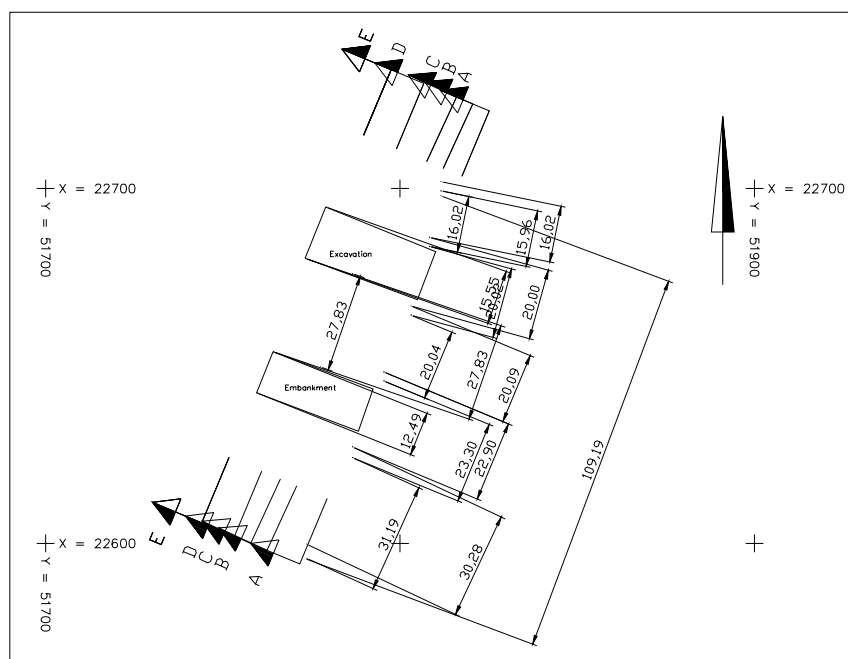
Plan view of the test embankment and excavation (1996, The City of Helsinki / Fundus)
